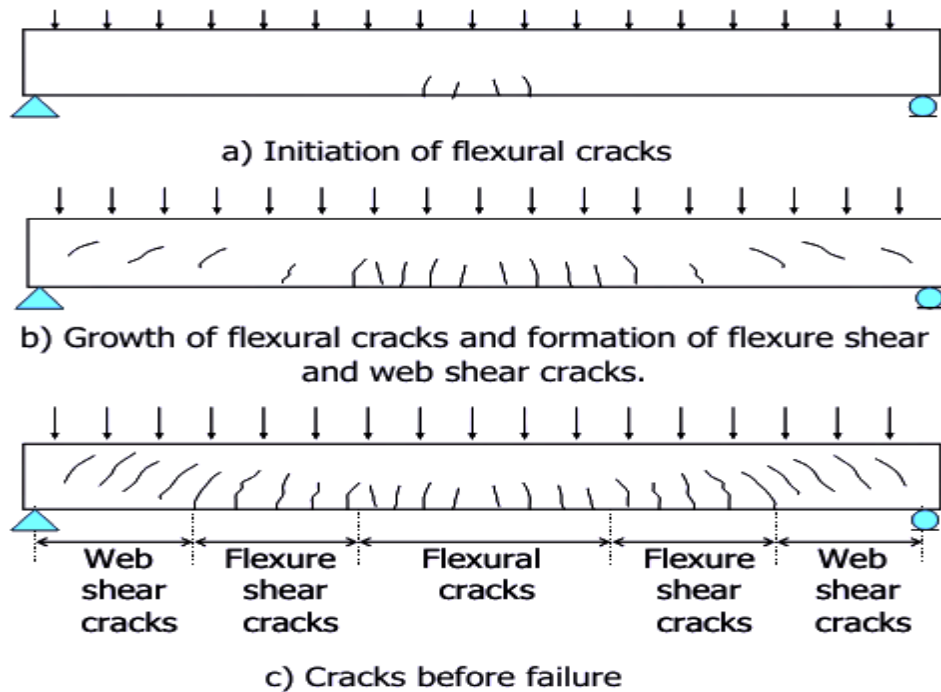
Formation of cracks in a reinforced concrete beam
